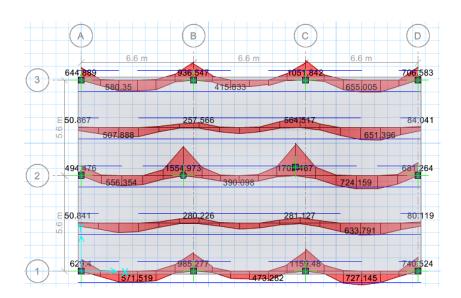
Along longer side reinforcement(SAFE:IS, with staggered column)
